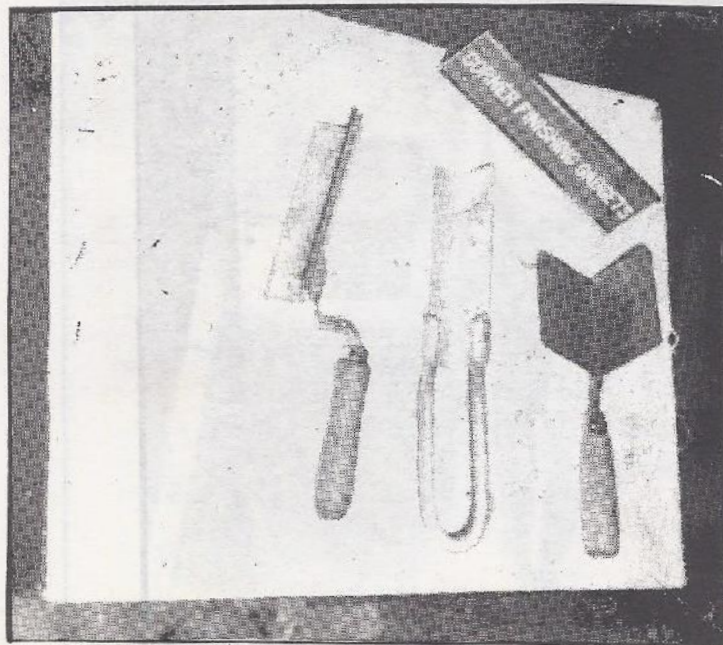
L-SHAPED GADGETS FOR MAKING CORNERS IN PLASTERING
